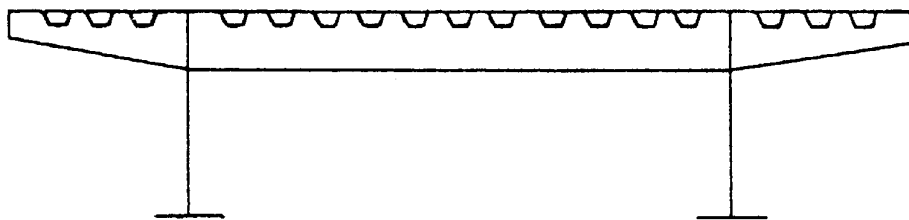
Cross-section of a two bay highway bridge with orthotropic deck.
